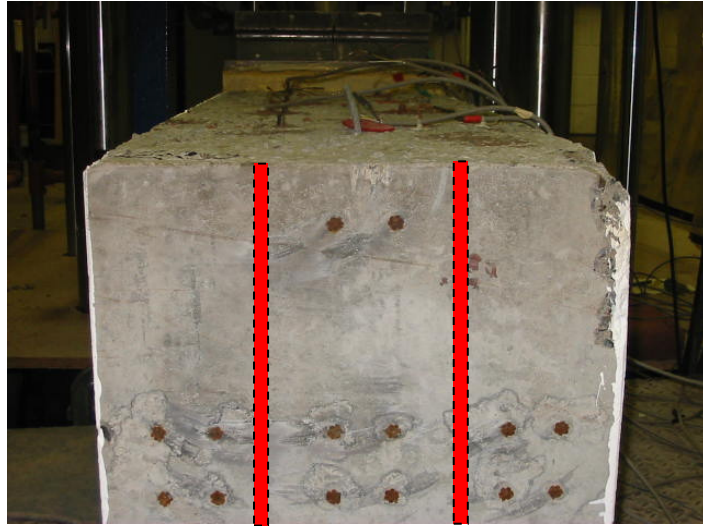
Position of the strengthening bars in the large-scale beam with two bars in the cross-section
